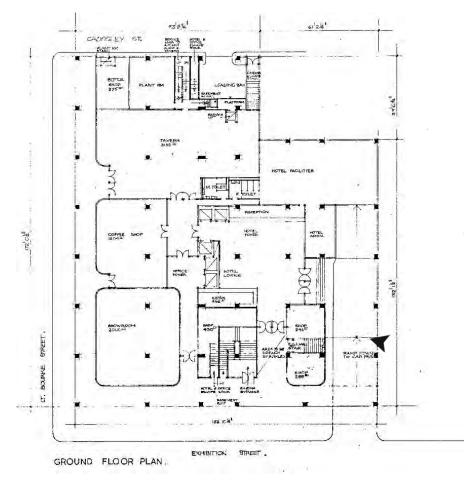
Ground floor plan. Drawings by Perrott Lyon Timlock & Kesa, date stamped 1970 (BAP).
